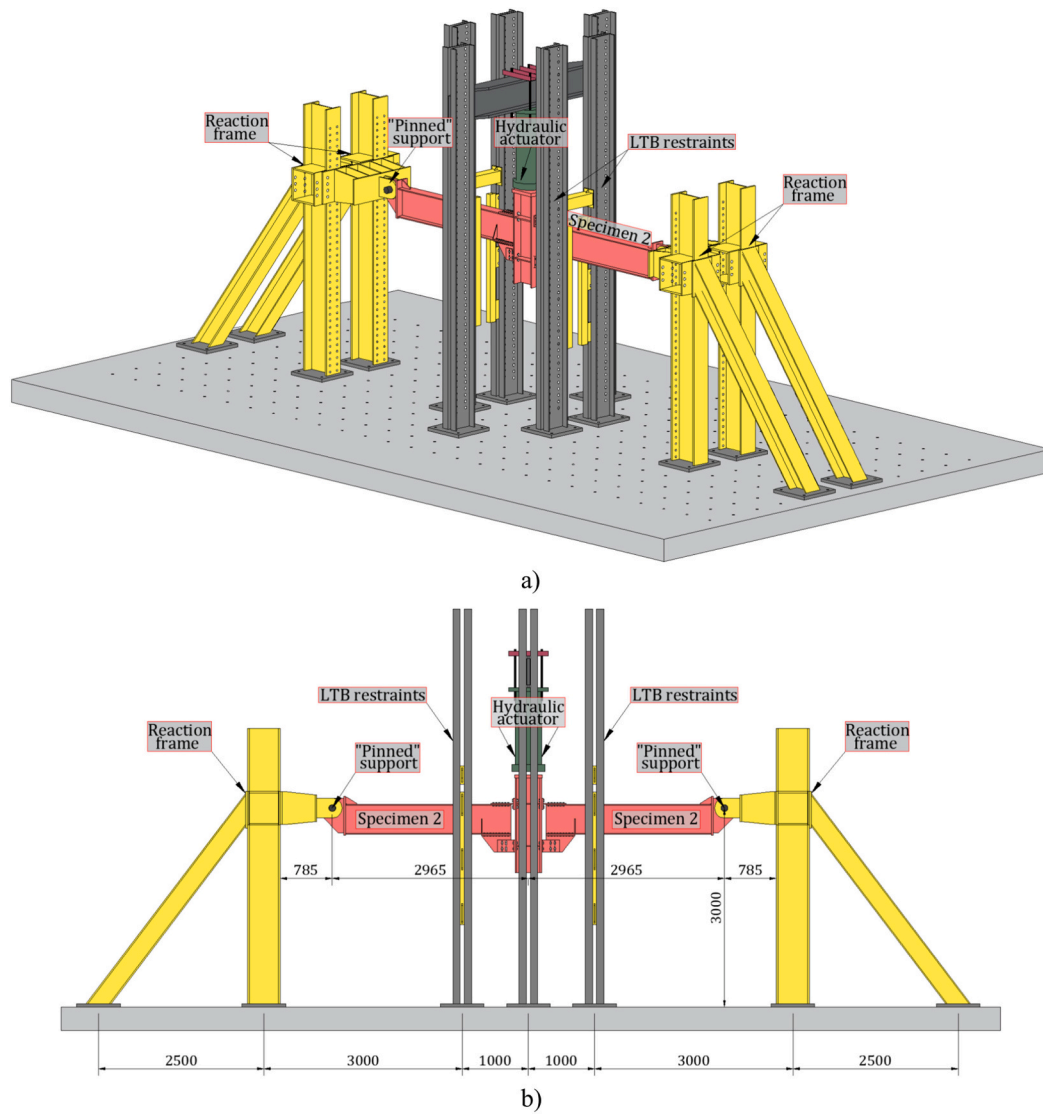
Test layout for Test 2: a) 3D view; b) Elevation.
